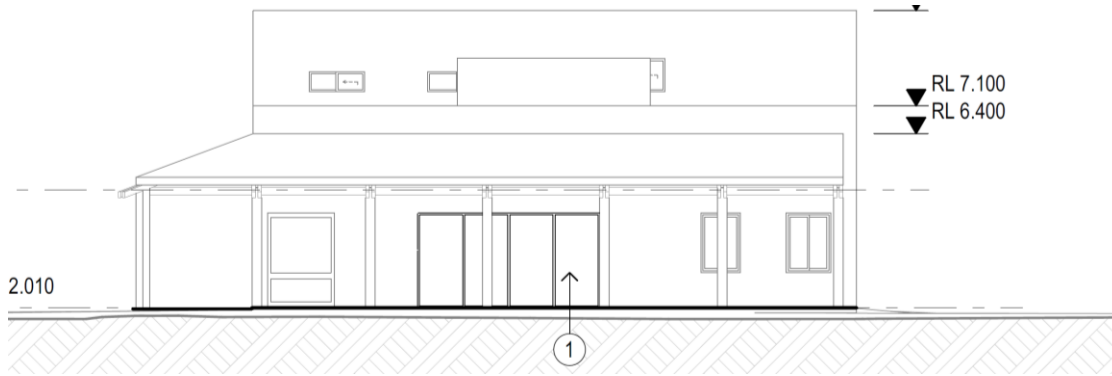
Proposed Works (East Elevation - To Esplanade)
